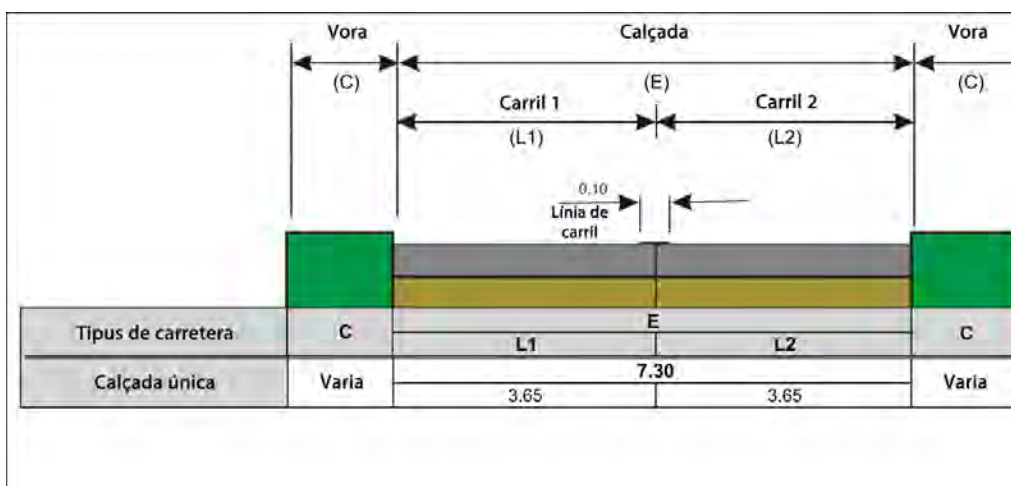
Dimensions of Cross-Section Components for Urban All-Purpose Roads Mainline (Single Carriageway)
